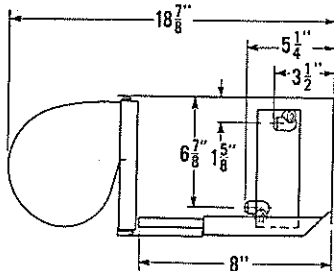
Dimension Drawing of UniTrane Horizontal Concealed Model.
